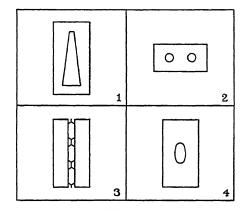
Sections Through Typical Heating Units of Extended Surface Type
